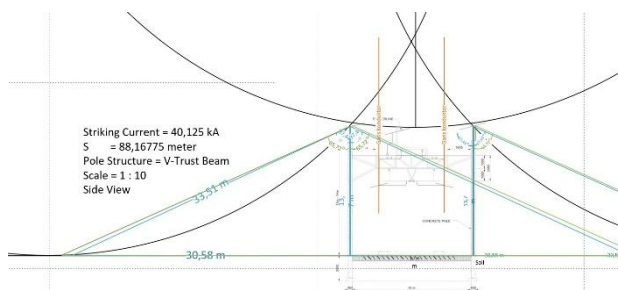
Protection Zone of OCS V-Trust Beam Pole with Striking Distance 88.17 m
